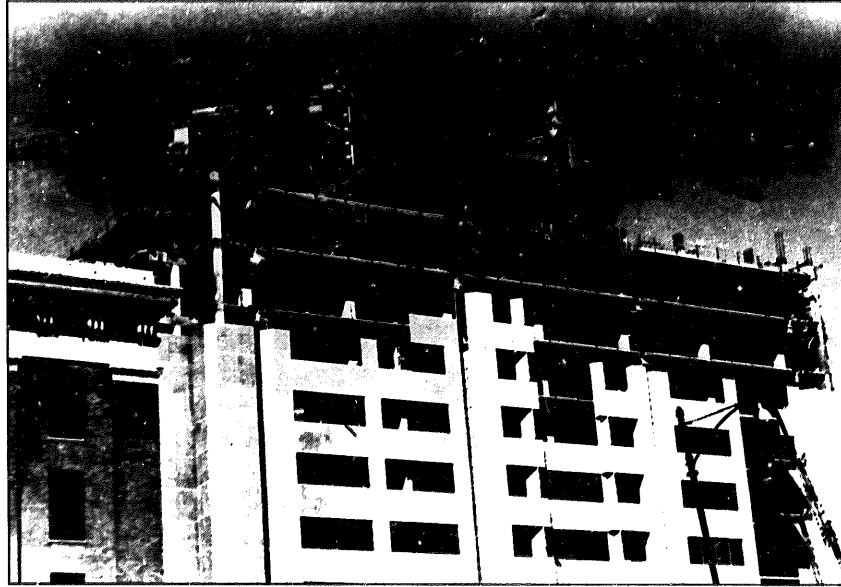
Photograph of a framed, light-clad building under construction. Note the column supports and the rotating, tower-mounted construction cranes.
